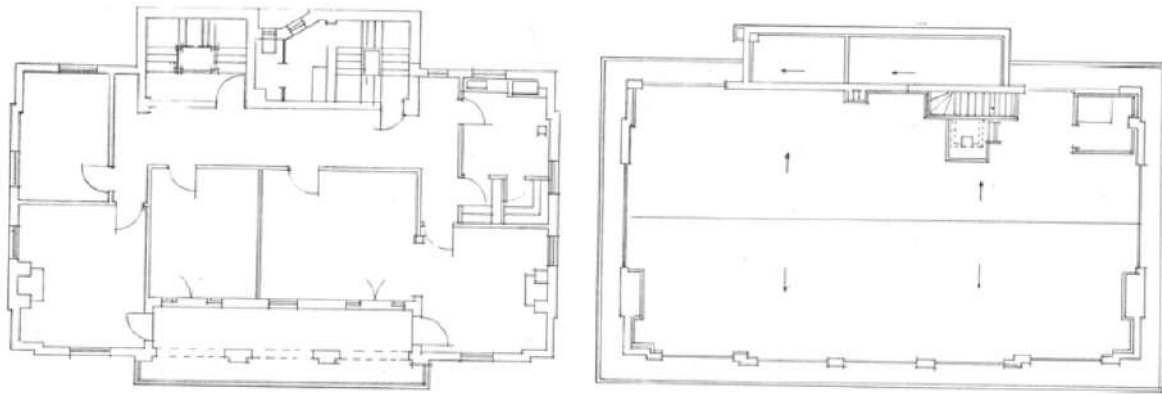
Second floor plan (left) and roof plan of the Bureau of Meteorology, 1962. (Source: TKD 2016: Fig 42).
